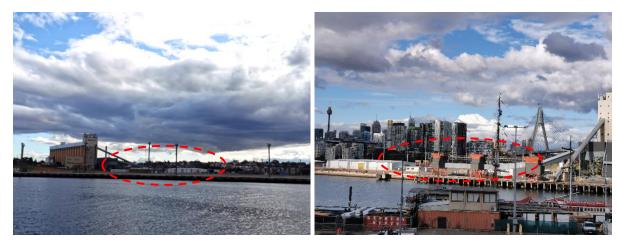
| Existing views looking at the site from Gl01 (Left) and Gl04 (Right) (Source: Site visit photos, DPIE, dated 22 June 2020)
